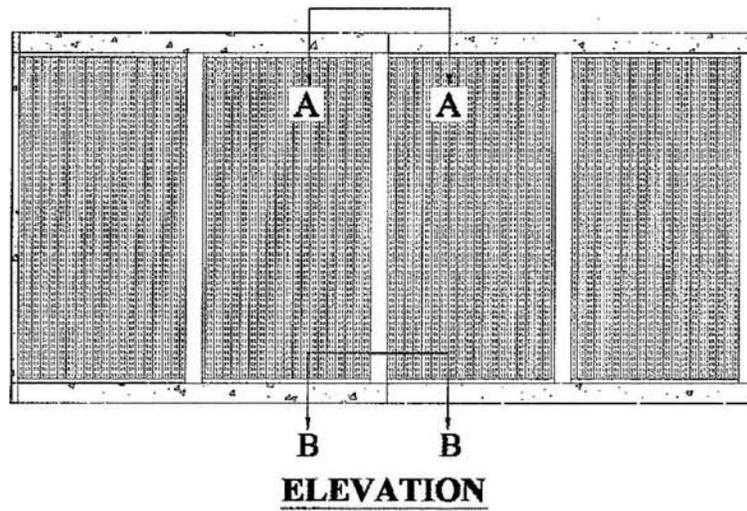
TYPICAL WALL CONNECTION DETAIL
